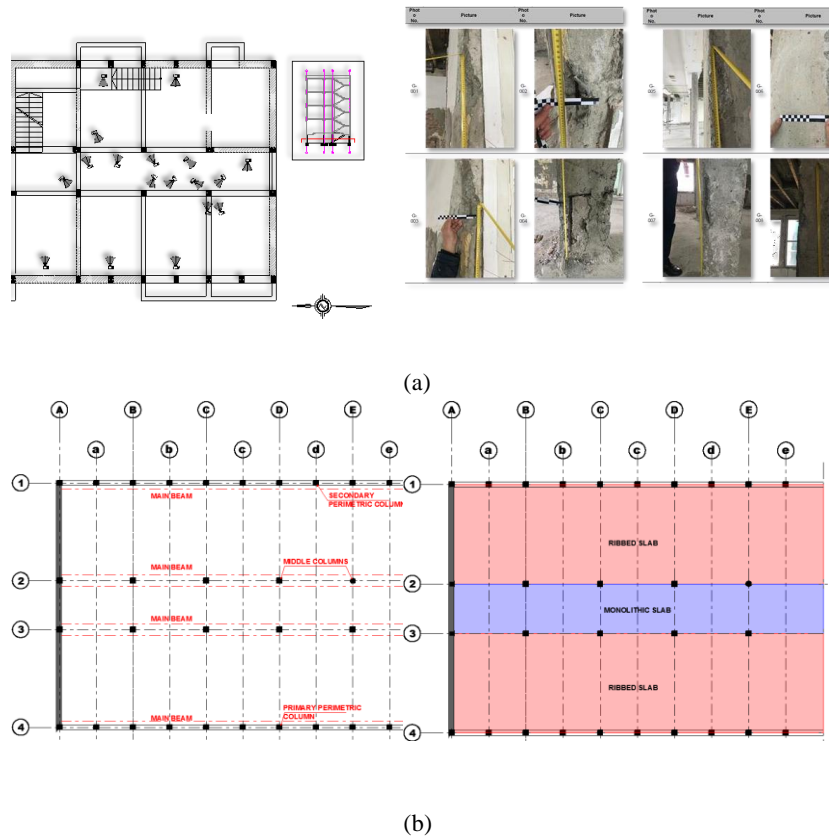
(a) Example of the photographic survey and mapping on the drawings; (b) Structural system of the existing building;
